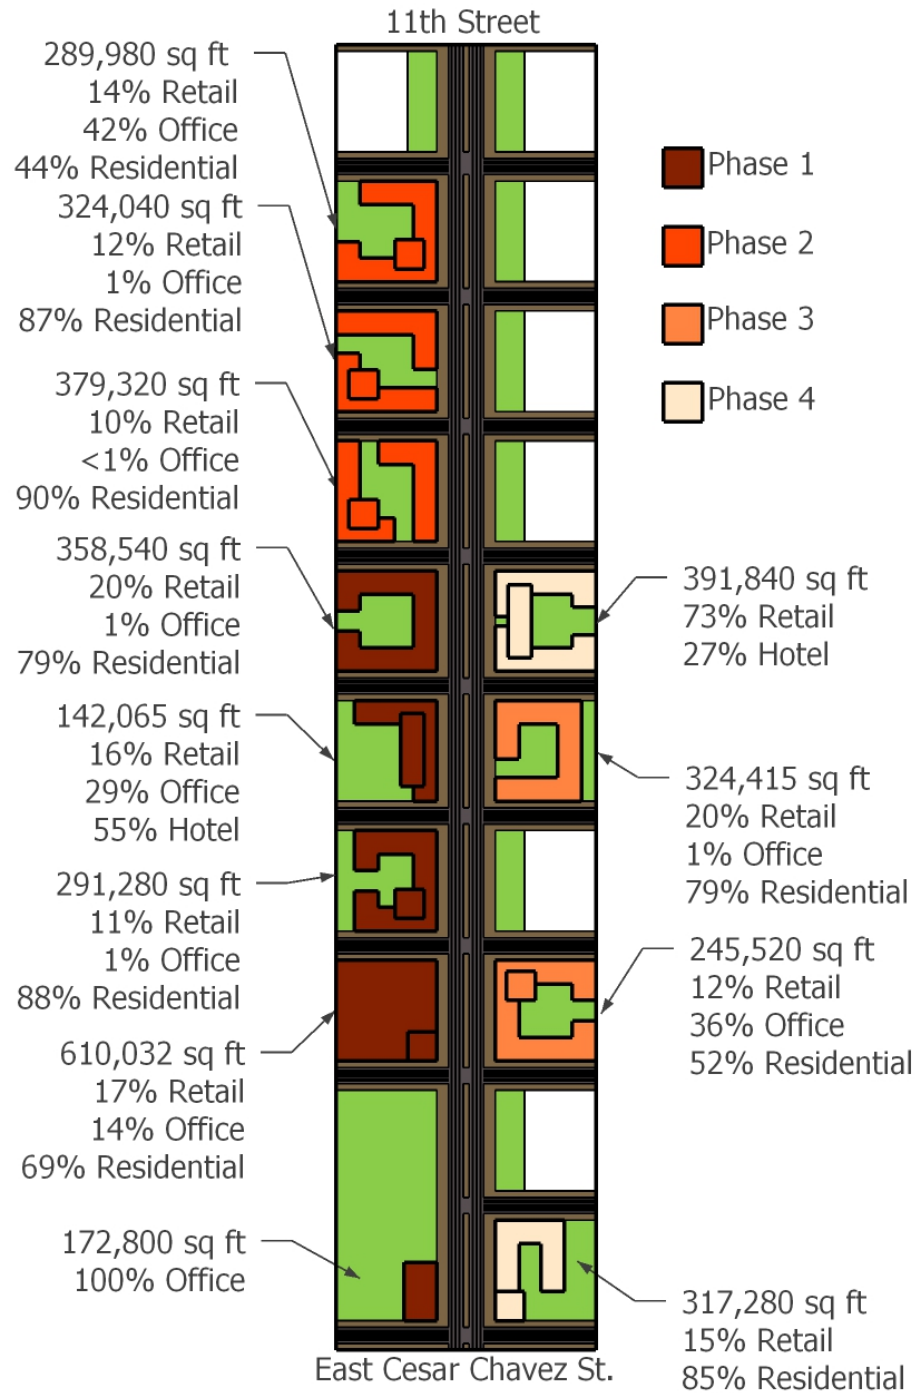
SketchUp Model of Building Layout from Cesar Chavez to 11th Street (Top View)
